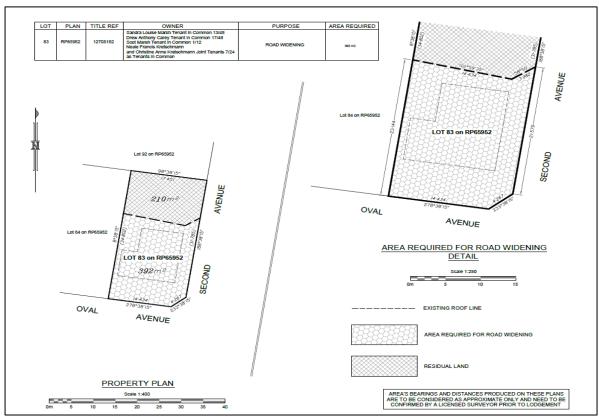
Resumption plan 15 Oval Avenue, Caloundra
